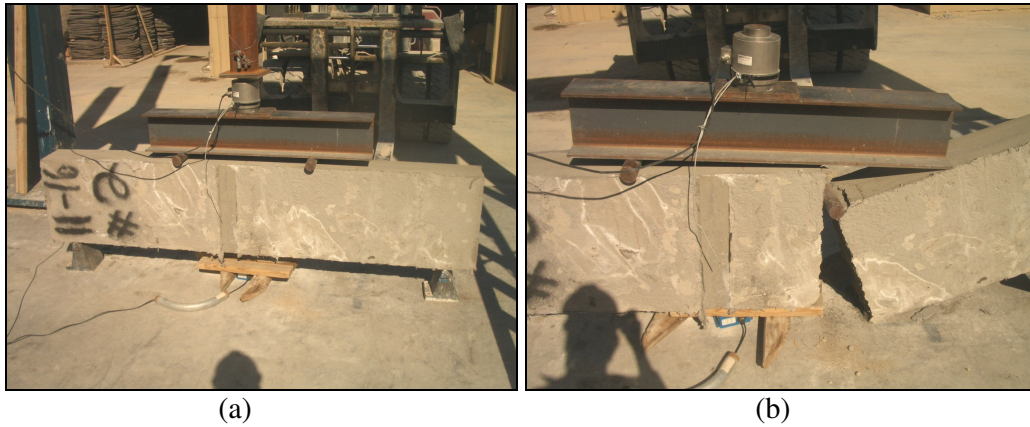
Beam for 2<sup>nd</sup> batch concrete cast on 11/16/06 for 1 day test;
